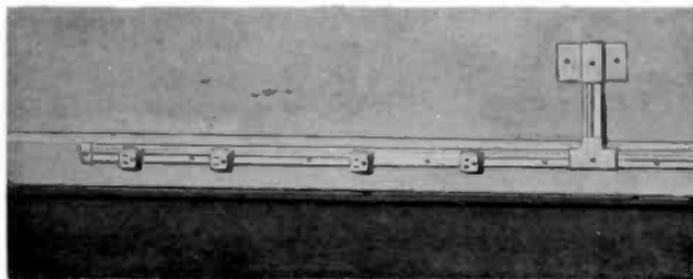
The finished surface wiring installations. Additional outlets are easy to add; they snap into place anywhere along the cable strip.
